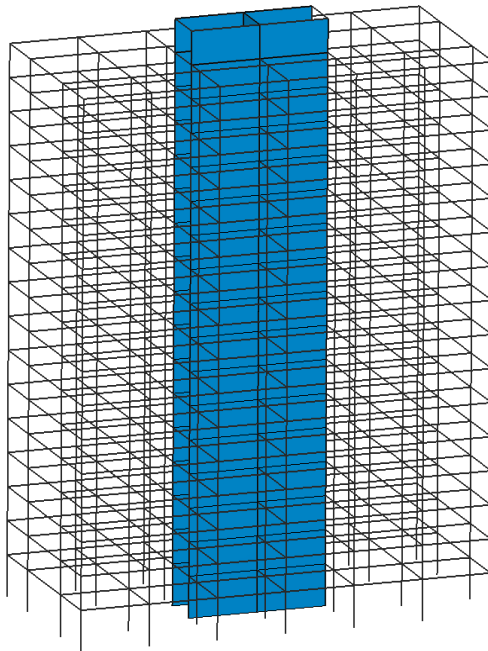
Sixteen story model with steel framework, floor slabs and elevator shaft
